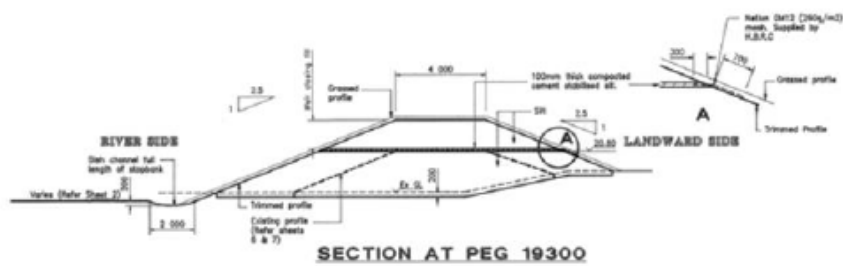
Extract of Heretaunga Plains Asset Management Plan detailing a designated breach point
